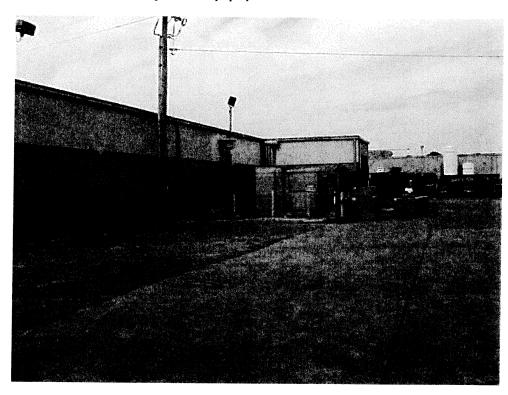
LOCATION: View facing north DESCRIPTION: Eastern exterior of the building with transformers
